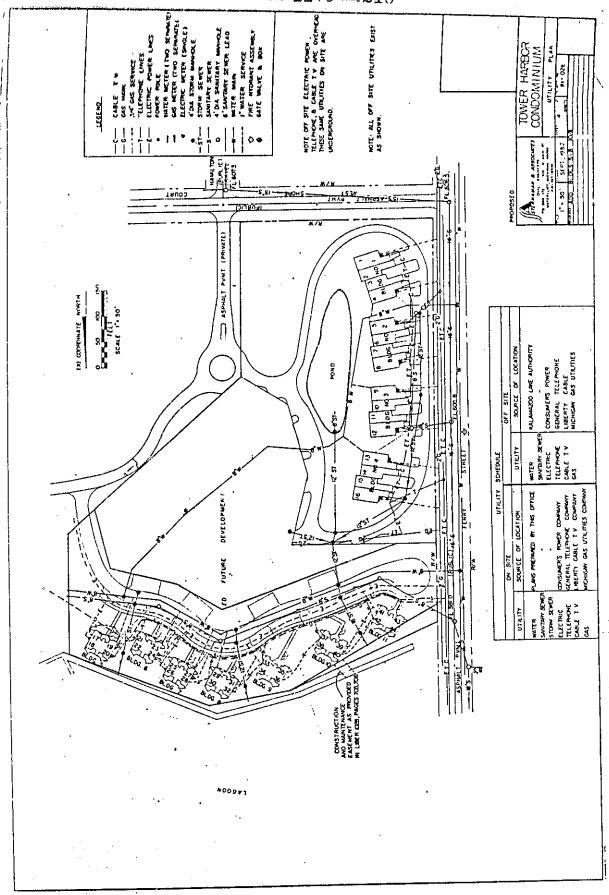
EXHIBIT B TO THE MASTER DEED OF SUBDIVISION PLAN
